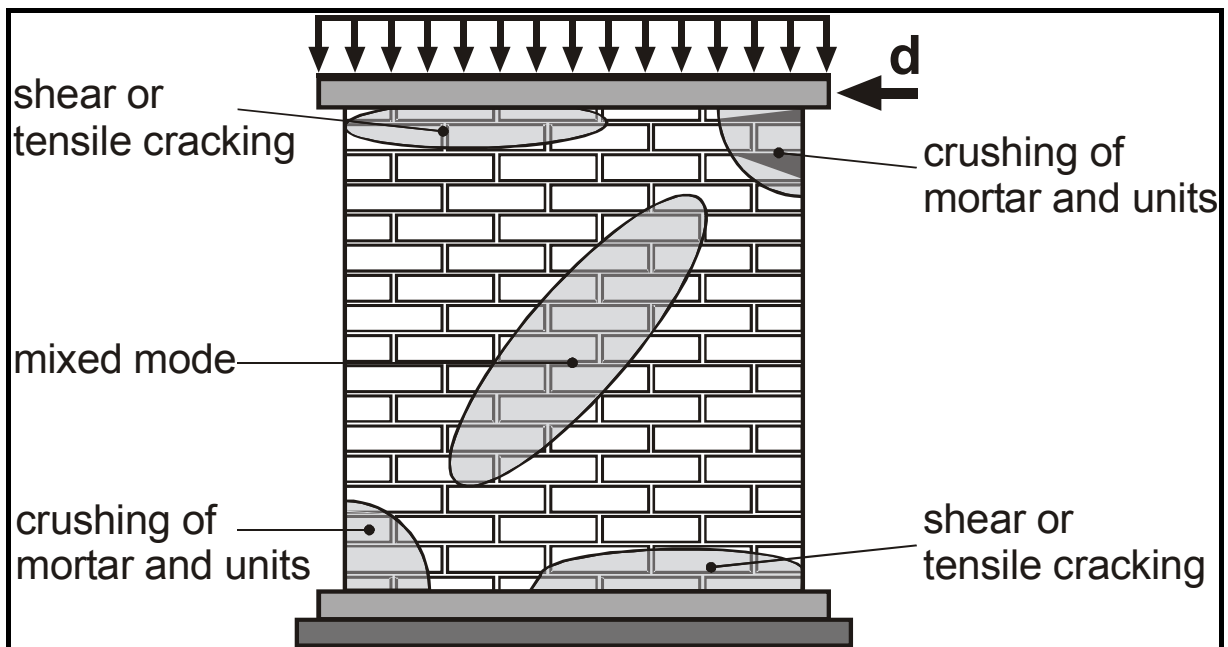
Modes of failure for shear walls without openings [112]
